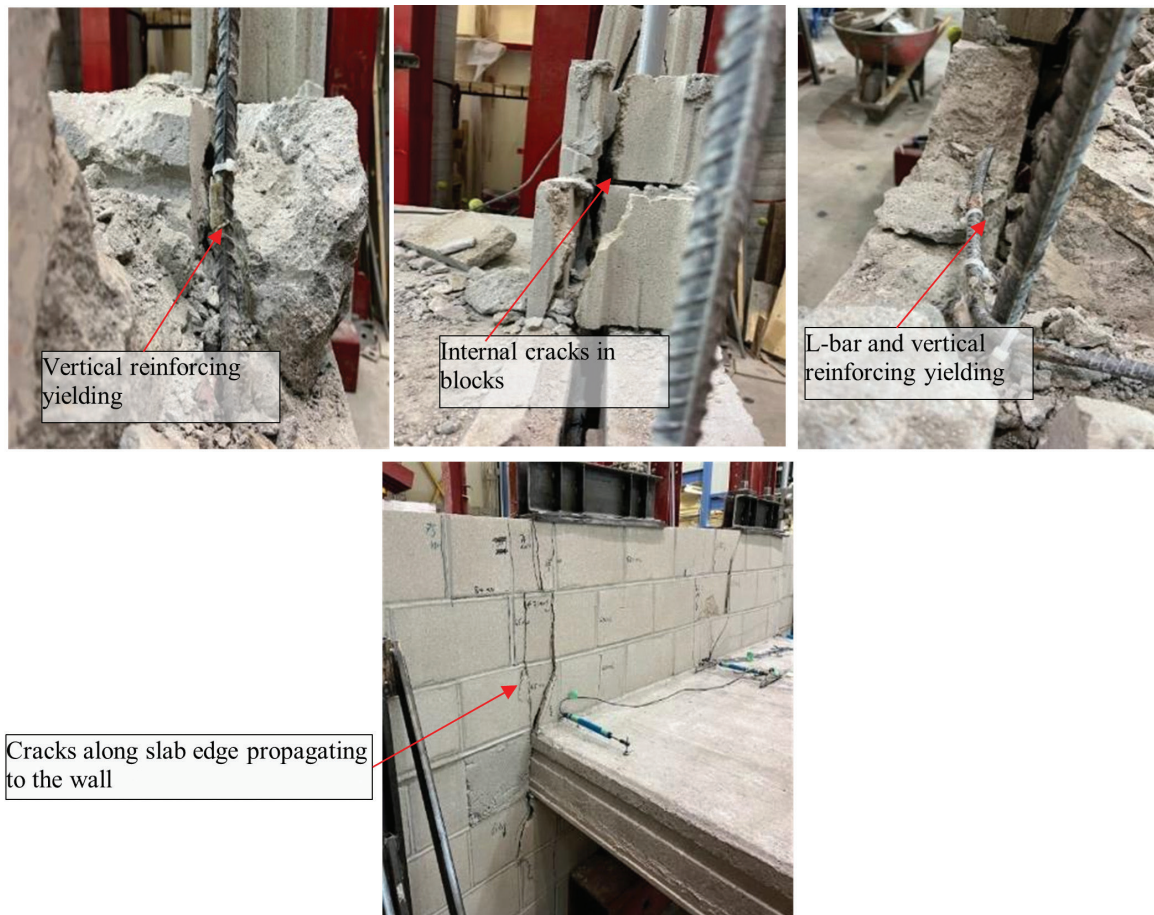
The mode of failure for specimen EB-T-L-1 (end bearing configuration with tensile loading and an L-shaped bar connection at the first story).
